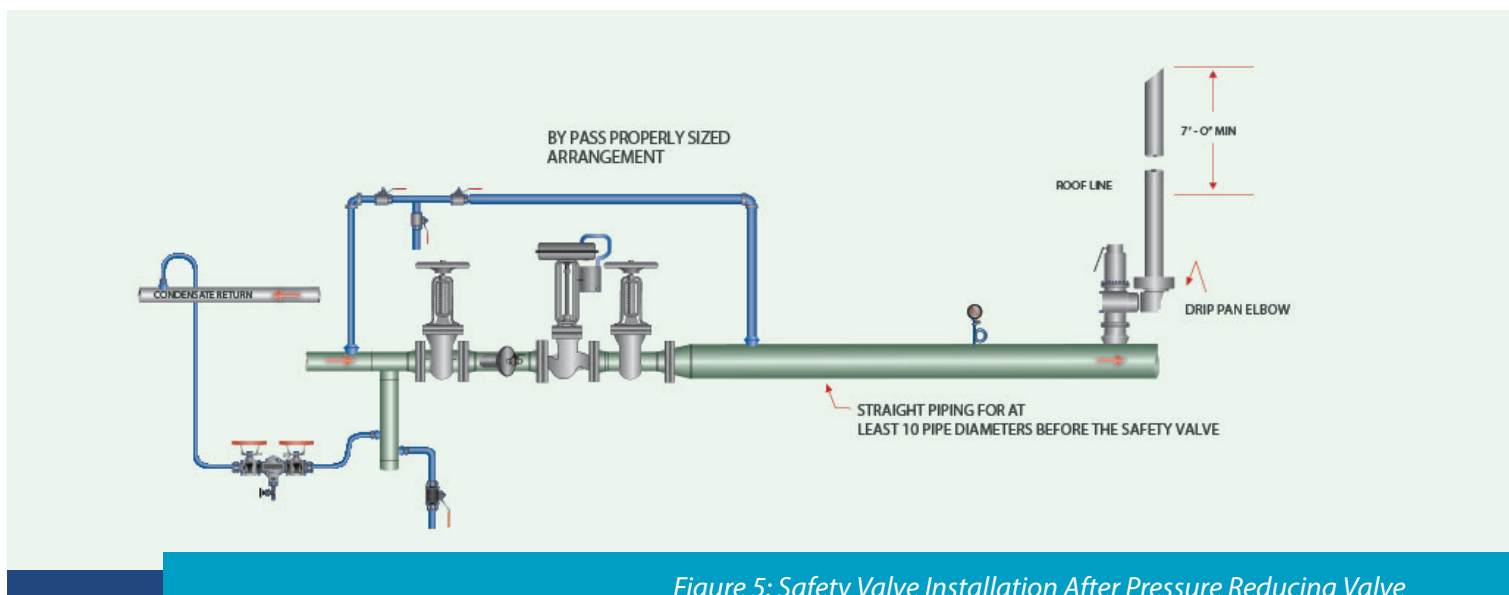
Safety Valve Installation After Pressure Reducing Valve
